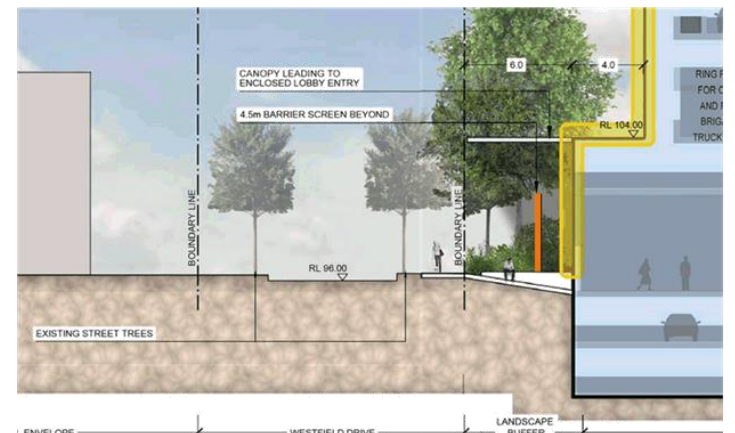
Detail of Section B-B, showing typical landscape treatment through proposed pedestrian entry from Westfield Drive (Floor levels are indicative only)
